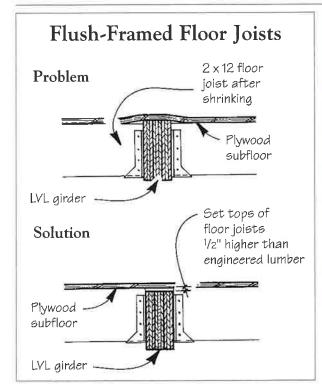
Floor joists laid flush with the top of engineered or steel beams will create a bump in the floor when they shrink (top drawing, left). In these situations, install the joists ¹/₂ inch high to accommodate the anticipated shrinkage (bottom drawing, left). Where I-joists meet an engineered lumber beam (above), you can install them flush since shrinkage is not an issue with I-joists.
